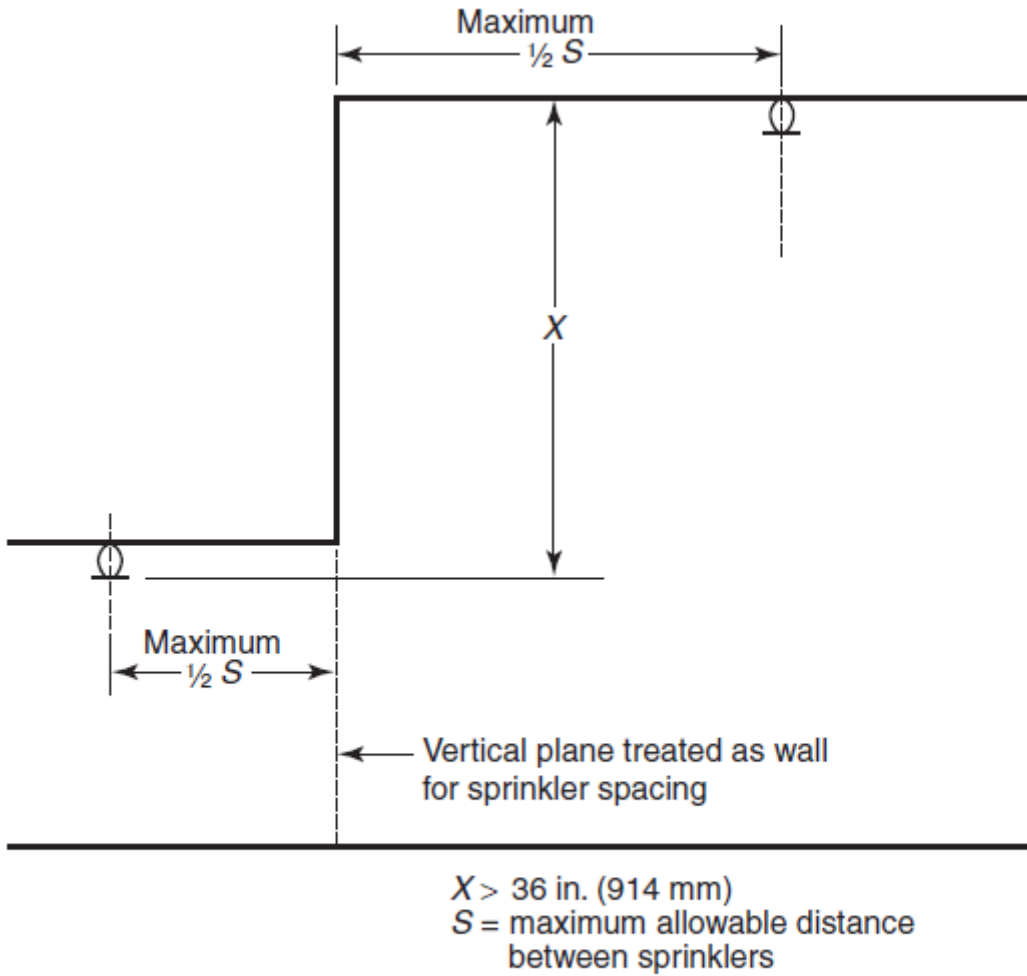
(A) Vertical Change in Ceiling Elevation Greater Than 36 in. (914 mm).
